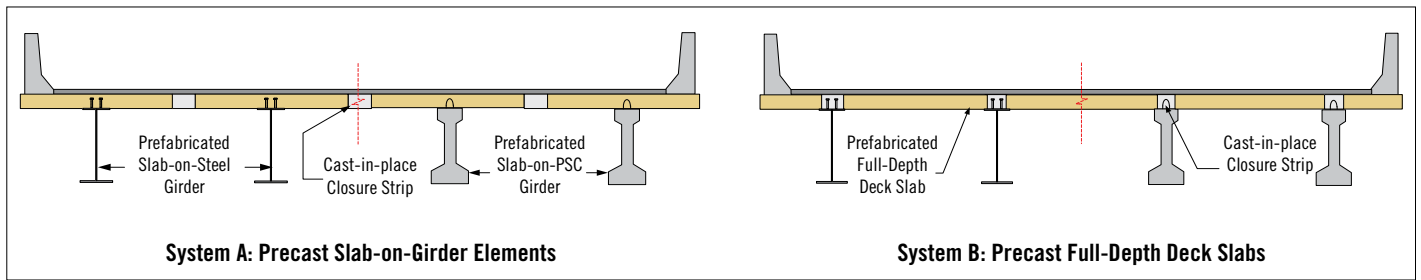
Prefabricated Bridge Systems Considered by MTO.
